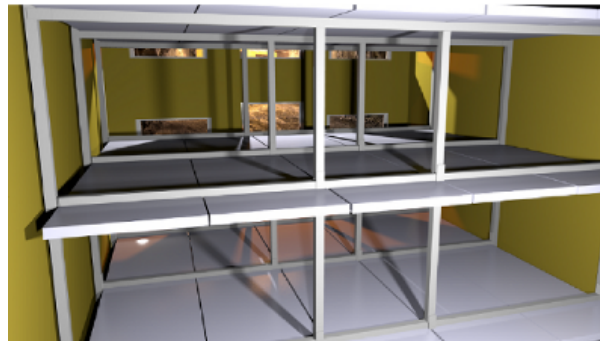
3D modelling of the placing the planks inside a three layer station. Each layer is consisted of five planks set side by side. (by Jari Joutsenvaara)
